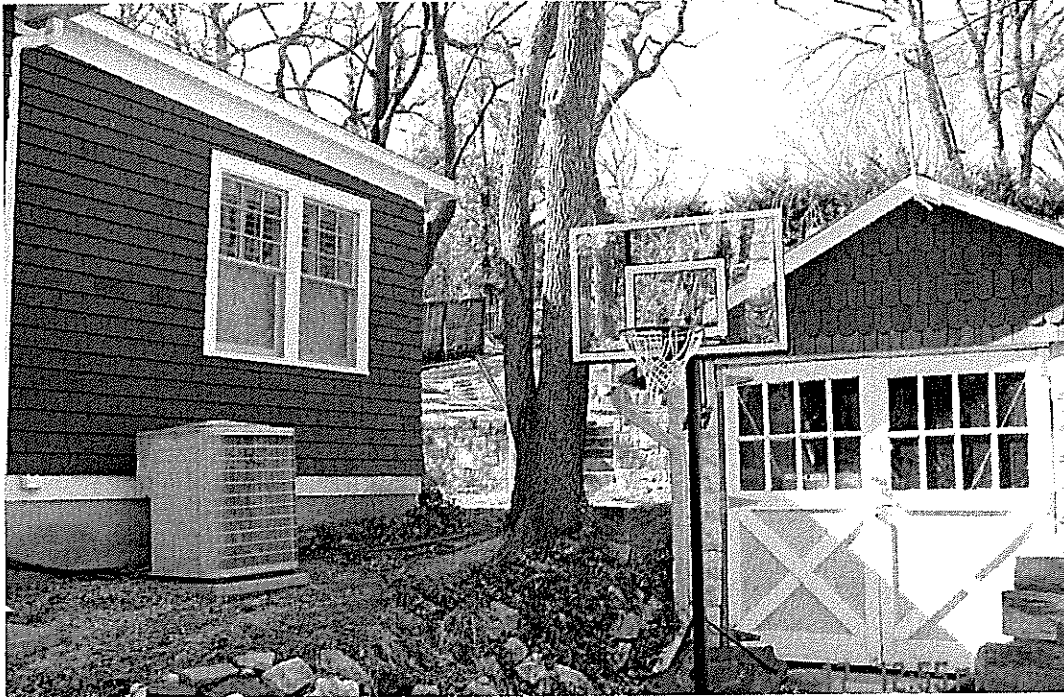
Willow Ave., Garage, with tree at left causing garage wall damage.
